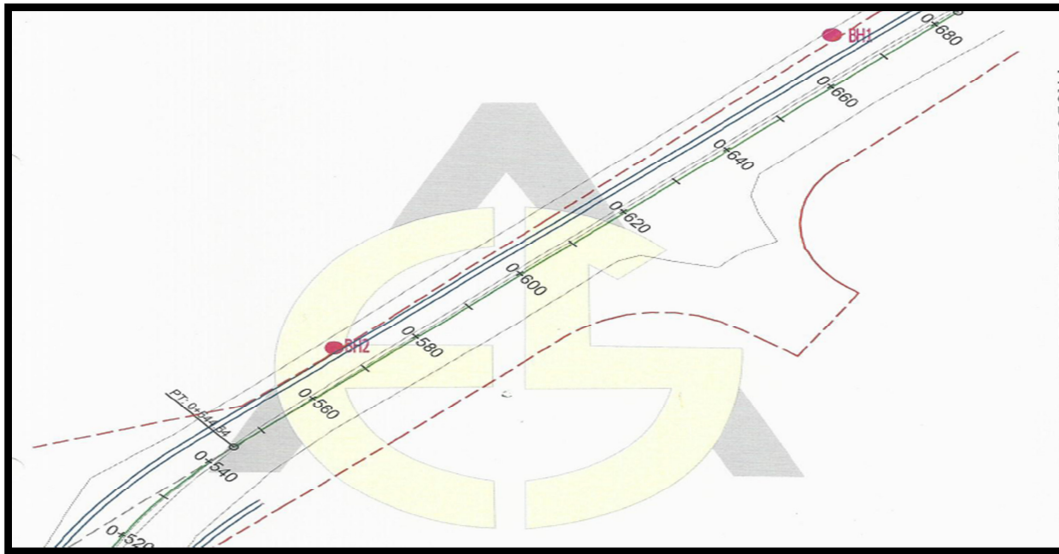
General Site Plan for the Study Project Including the Location of the Proposed Retaining Wall (Provided by: Engineering Axes for Studies, 2013)
